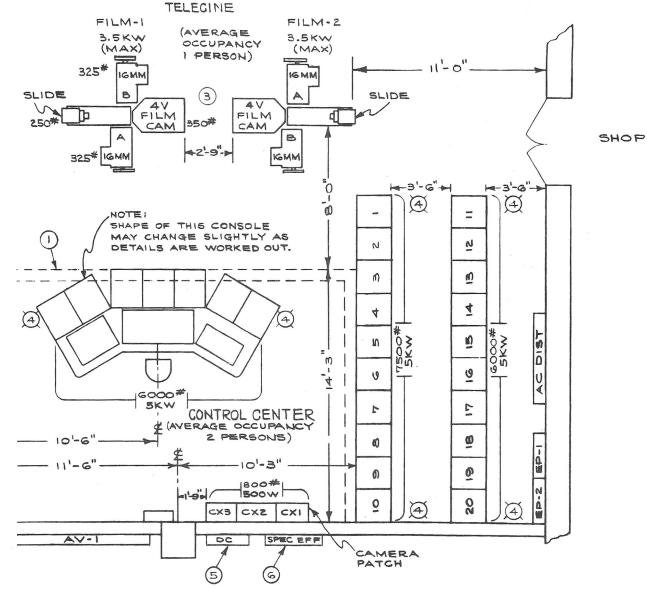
A floor plan drawing of the type prepared for use by an architectural design group.
